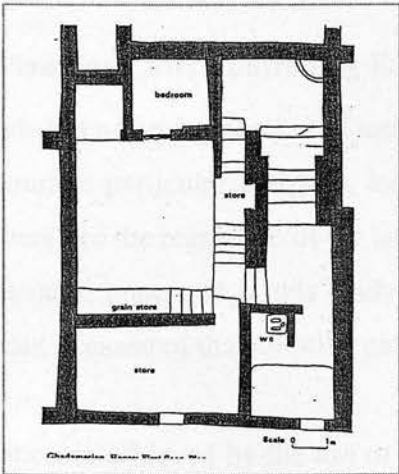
19 Ghadames house plan. Note abundance of storage areas (Abdalla, M 1998)
